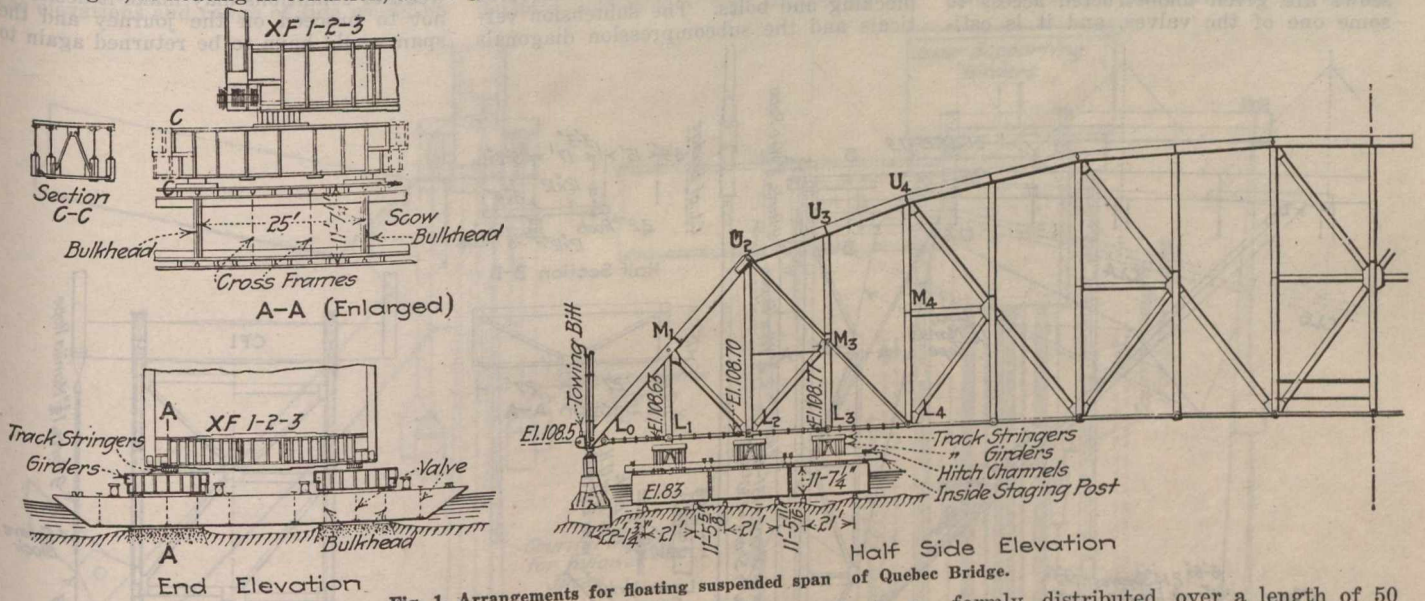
Arrangements for floating suspended span of Quebec Bridge.
